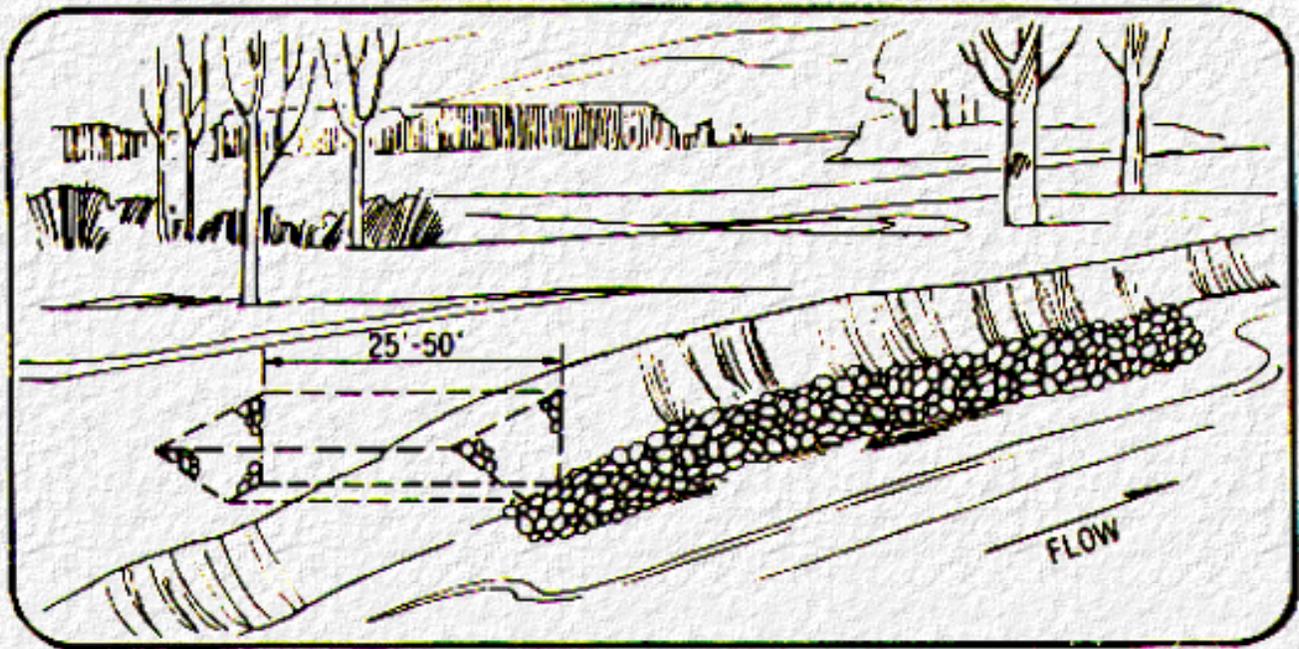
Tie-in Trench to Prevent Riprap Blanket from Unravelling (after Kesum, 1983)
